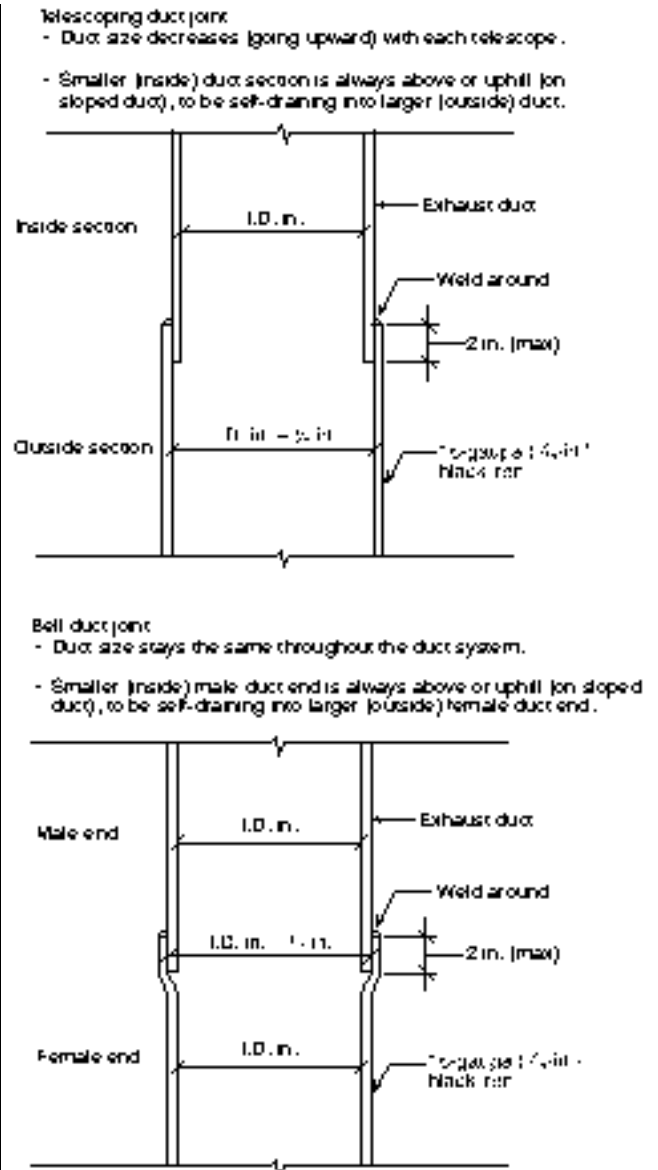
Telescoping and bell-type duct connections.
